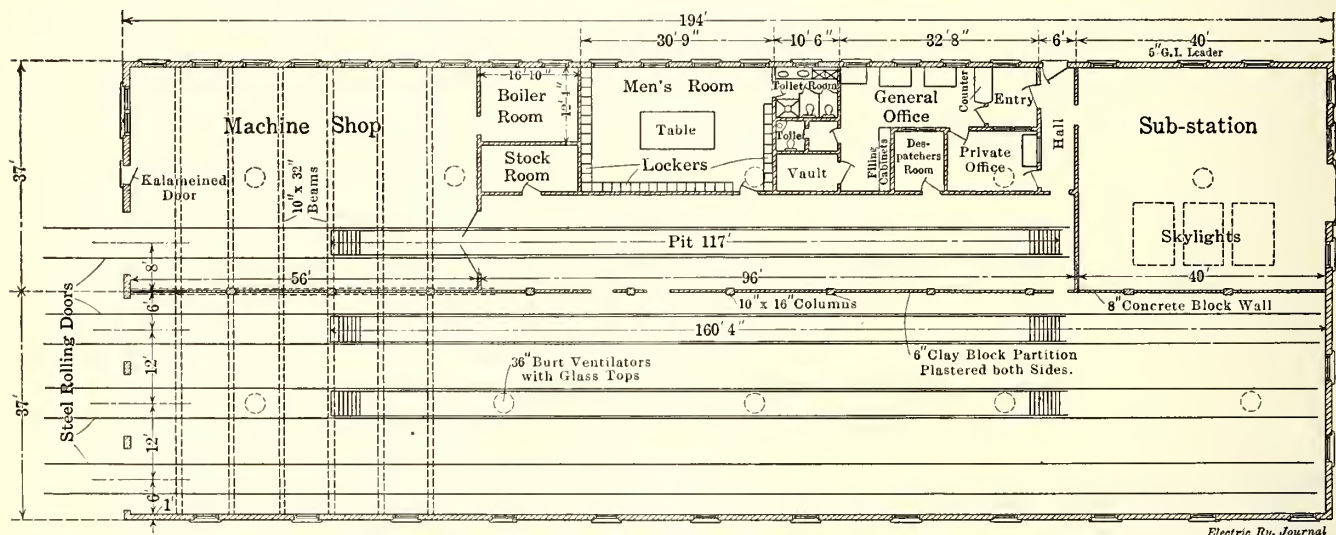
Shore Line Railway—Floor Plan of Carhouse at Saybrook
